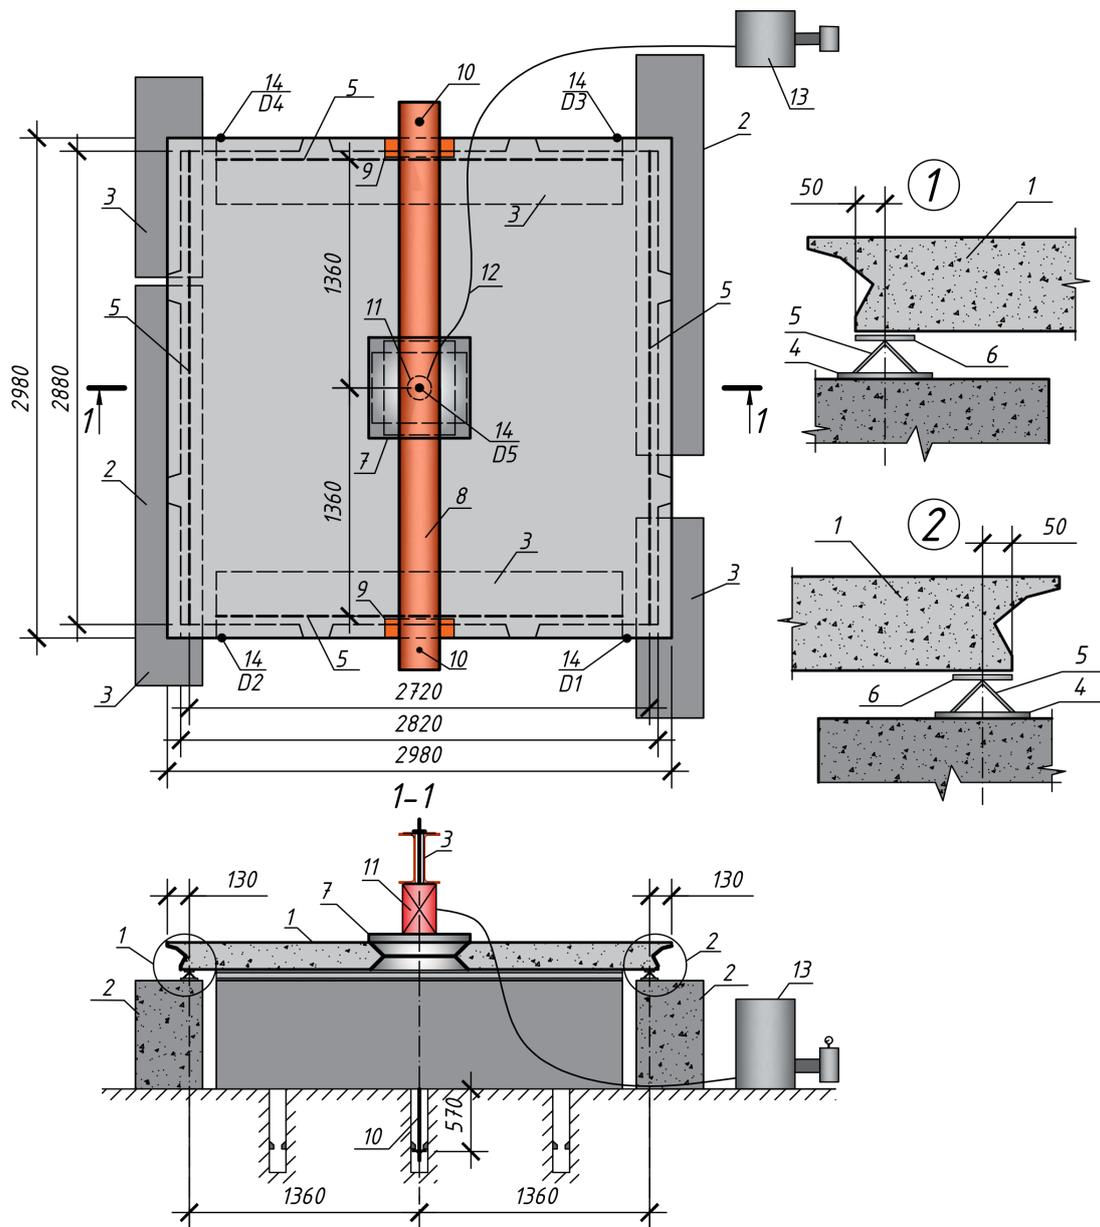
Test scheme of the over-columned plate: 1 – plate PO; 2 – supporting element (concrete block FB 24.6.5); 3 – supporting element (concrete block FB 12.6.5); 4 – steel plate (strip 150×10); 5 – unmovable hinged support (steel angle bar 75×5); 6 – steel plate (strip 100×8); 7 – steel plate (strip 600×5); 8 – traverse (2 channels No. 30); 9 – temporary support for the traverse; 10 – steel bar (Ø30A240); 11 – hydraulic jack F = 500 kN; 12 – oil pipeline; 13 – pumping station; 14 – 6PAO watch-type deflection gauge.
